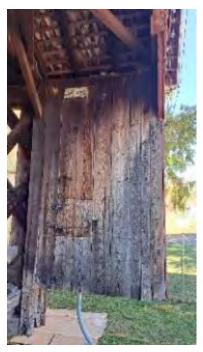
Abutment 1 North side wing wall view of internal siding.
